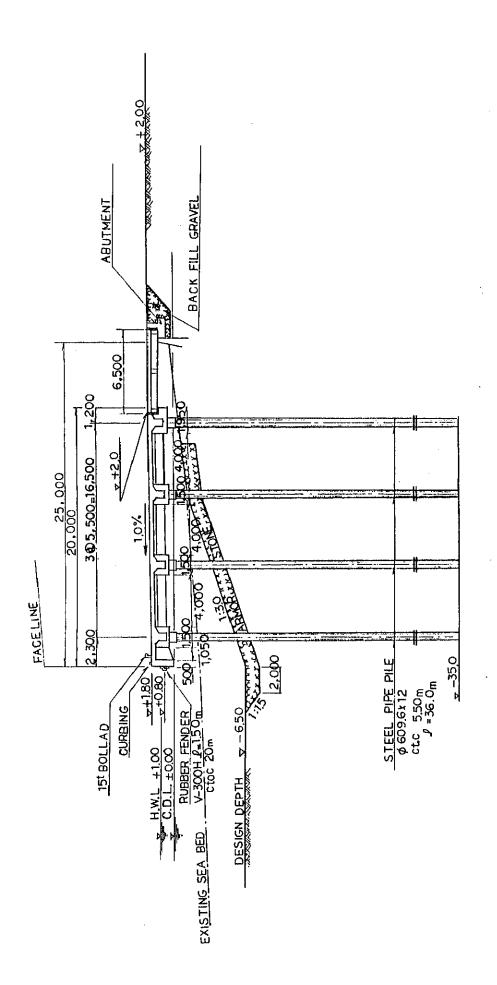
Design of Type-C (Steel Pipe Pile)
